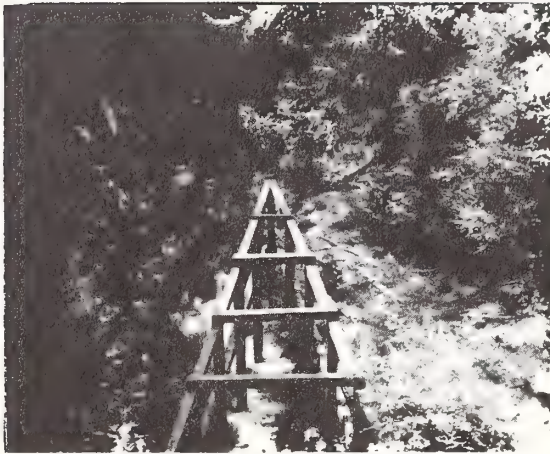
Timber pile debris deflector for boulders and heavy floating debris.
